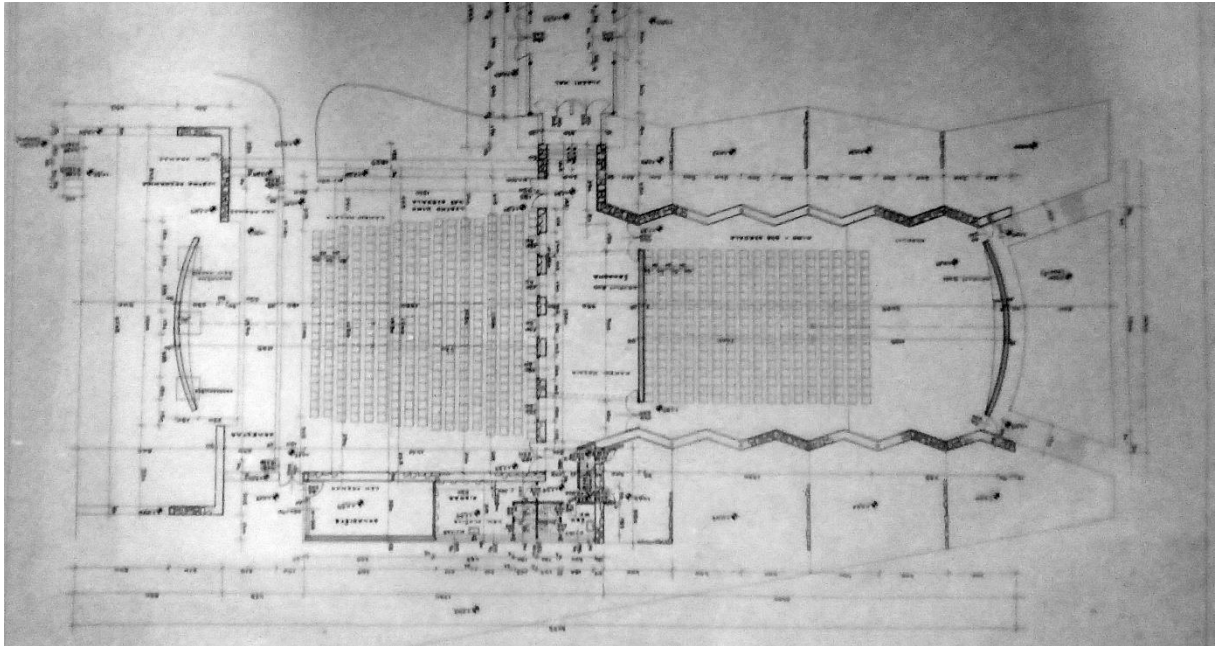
Plan, Example project for summer cinema in Sućuraj Hvar
